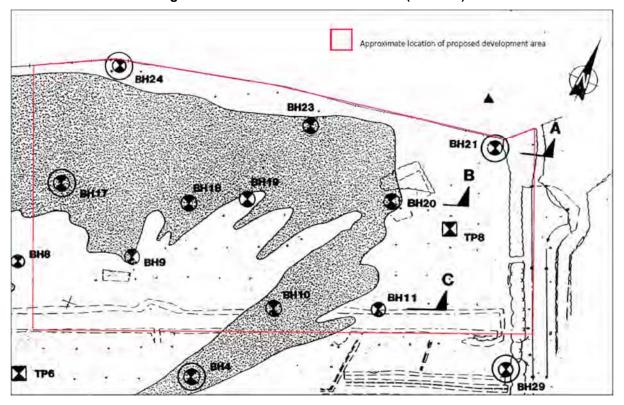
Borehole and Trial Pit Plan (Ref 14.6)
